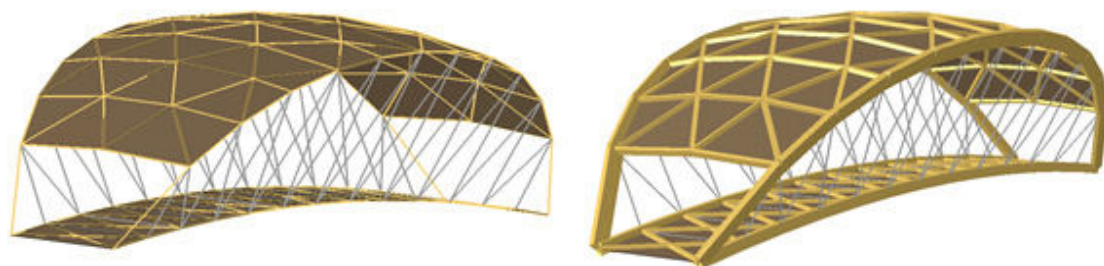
Roof truss elements closer to the mid-span (to the left) and roof truss elements closer to the end of the bridge (to the right).
